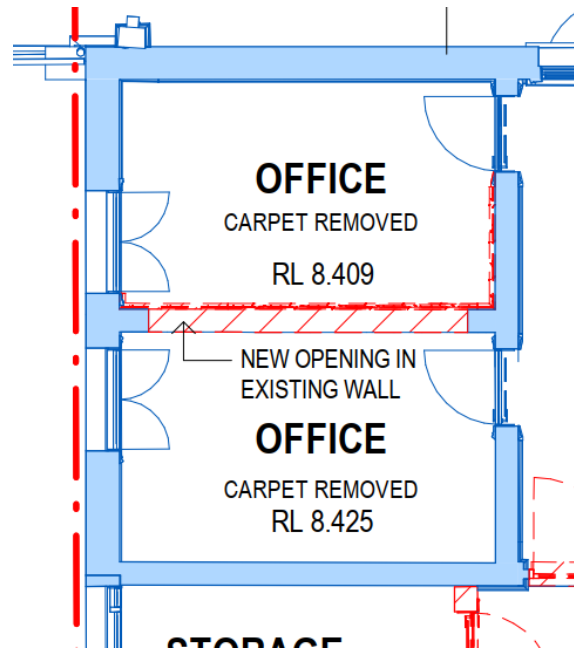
Extract from Approved Plan AR2.13 - Demolition Plan – Level 1
